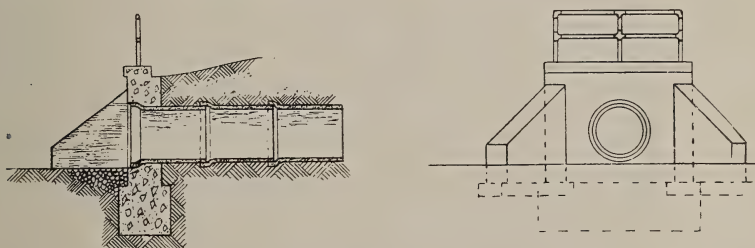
Section and Elevation of the Concrete Head and Wing Walls protecting a Tile Culvert
